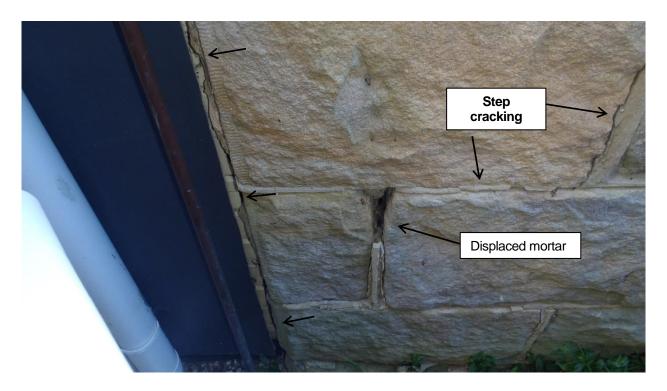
shows displaced (fretting) mortar to the brickwork at the front south western corner and previous repairs above the electrical meter board
